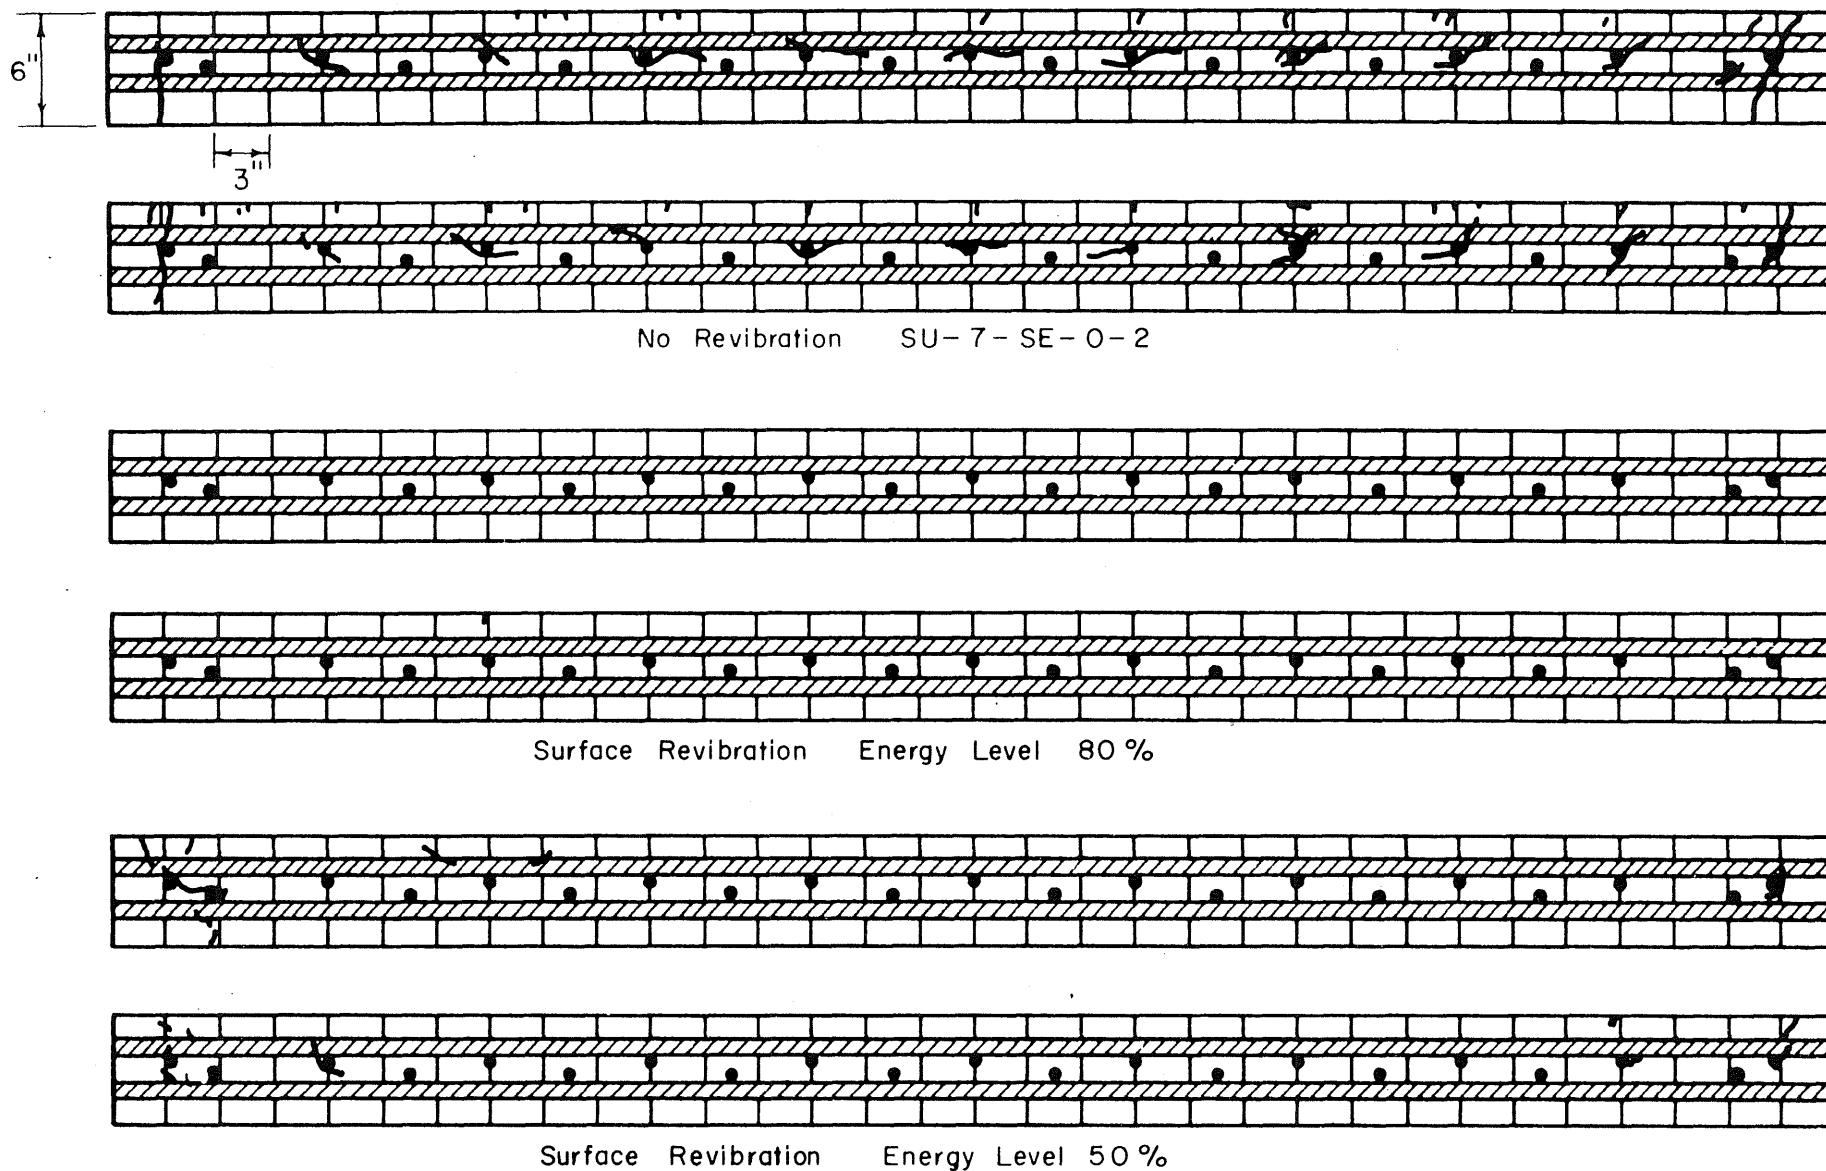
SECTIONS OF CONCRETE SLABS WITH HORIZONTAL CRACKS: SURFACE REVIBRATION 4 HOURS AFTER MIXING — ENERGY LEVEL: 50 % or 80 %
